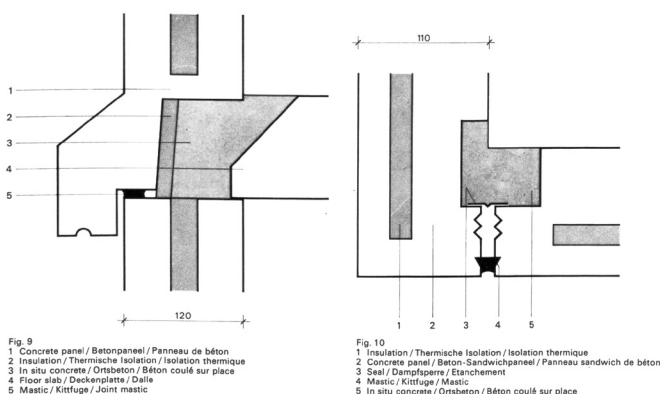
Joints between panels in France showing the concrete poured in situ. Carlo Testa. *Some practical construction details of building systems*. In: T. Schmid and C. Testa. *Systems building*. Zürich: Artemis, 1969, p. 101
